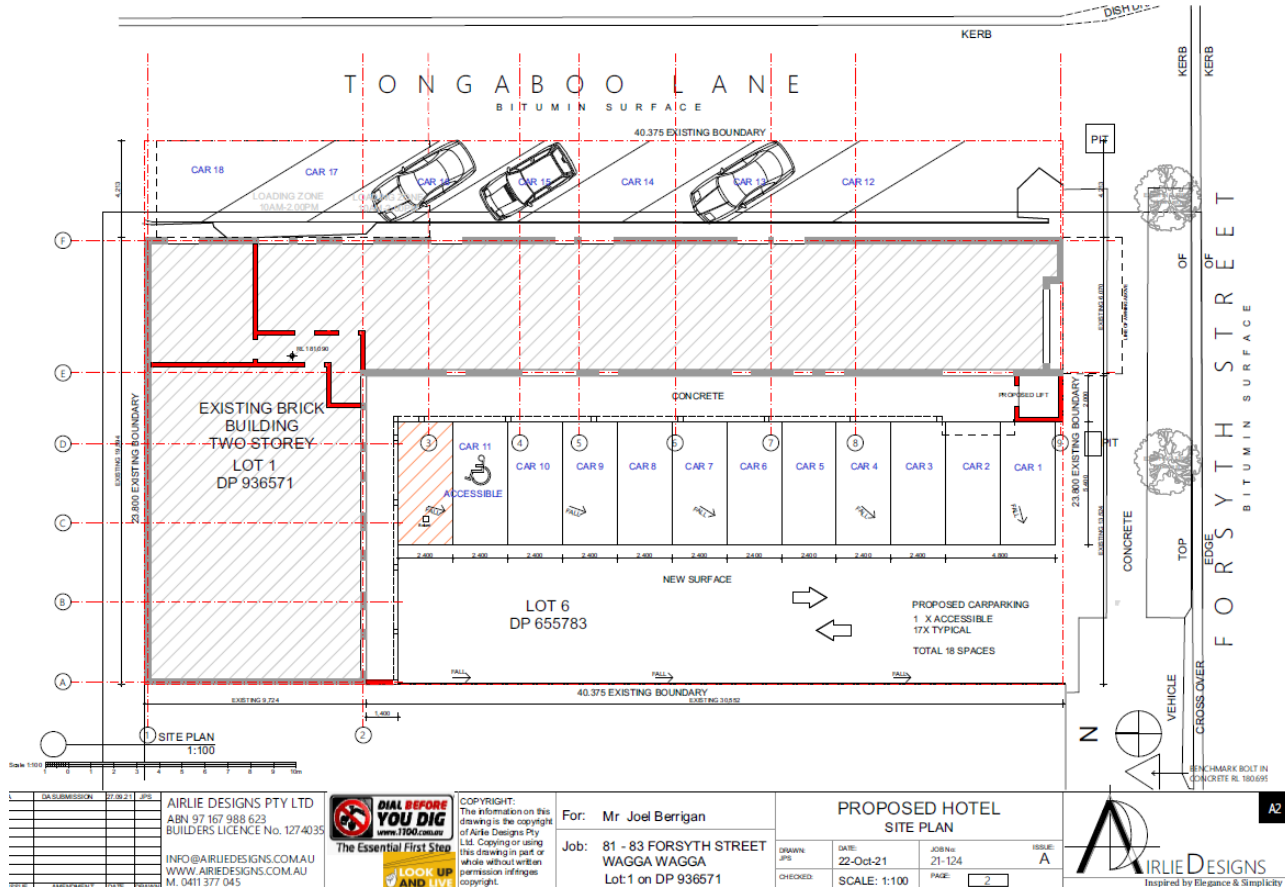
Extract of Site Plan (Airlie Designs, 2021)
